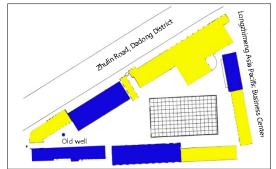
Architectural drawing of preservation and demolition of Laolongkou distillery
